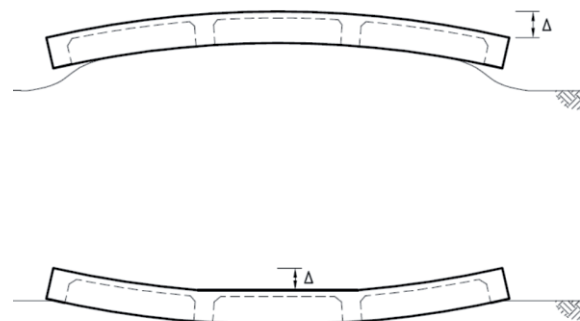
Footing movement: centre heave (above) and edge heave cases respectively.
